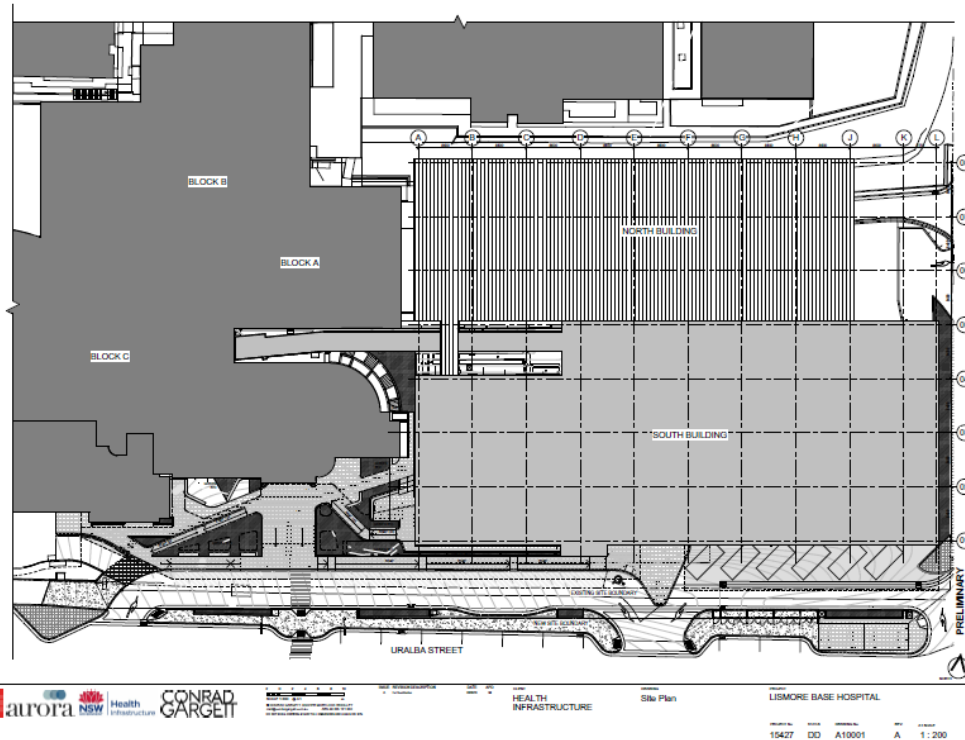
Overlay of Stage 3B1 South Tower and 3B North Tower Buildings
